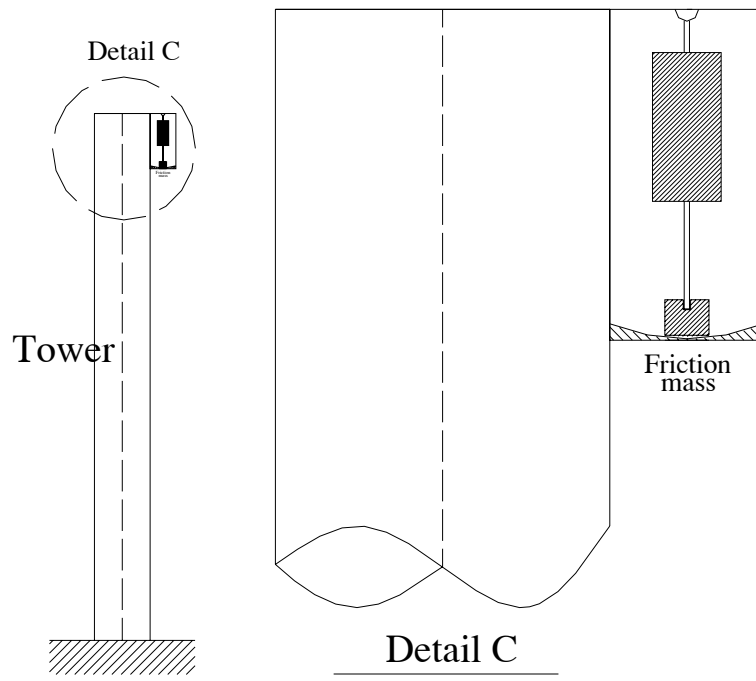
The tower is damped by using a pendulum mass with a bottom rod. The damping is achieved by the friction mass that slips on the bottom plate
